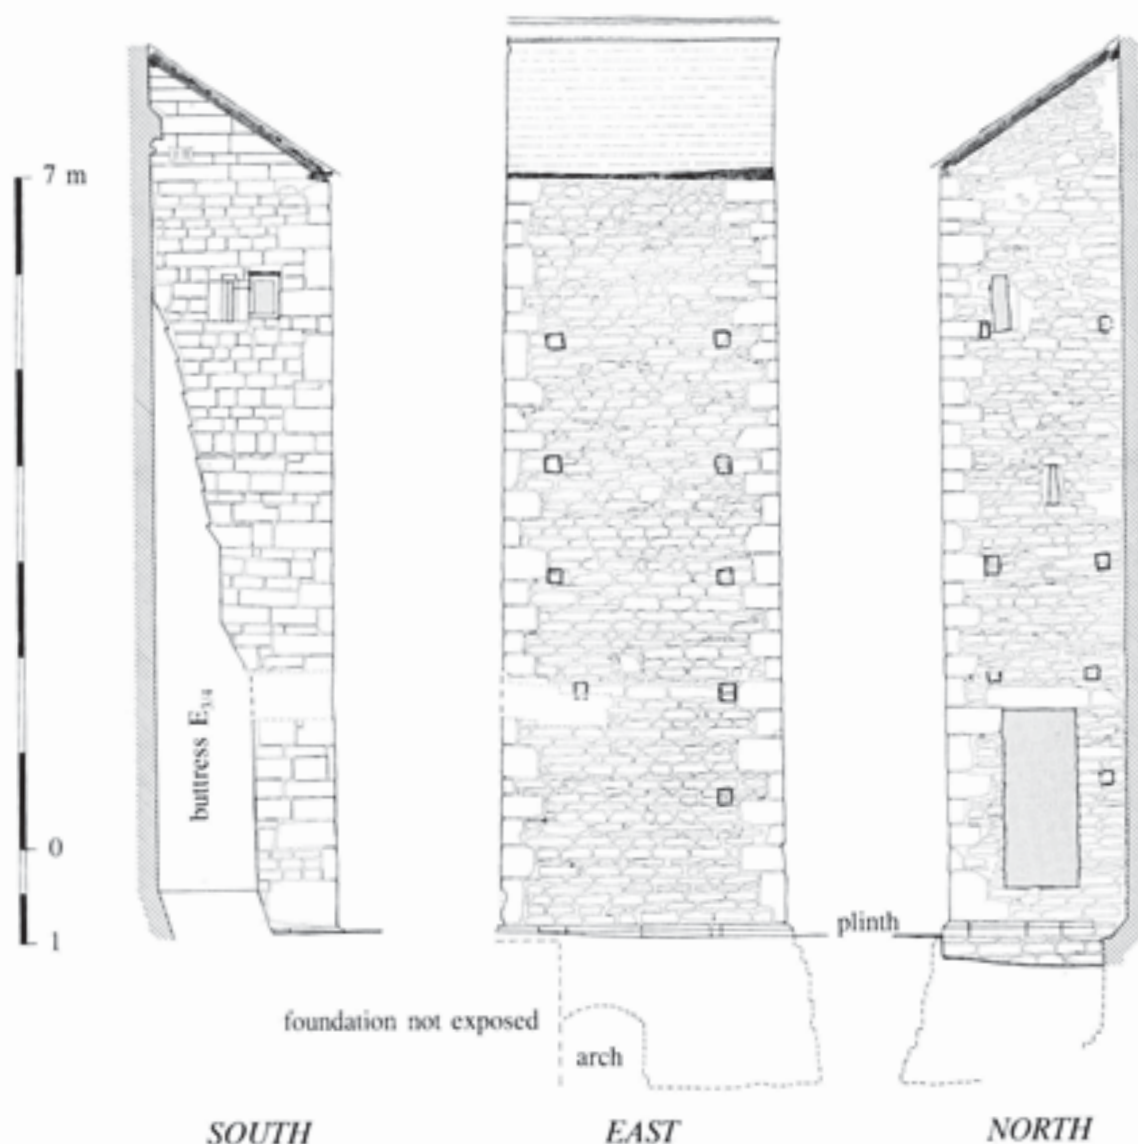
Elevations of the library latrine tower (Structure 14), partly based on photogrammetry. Foundation profiles have been added from excavation. Scale 1:80
